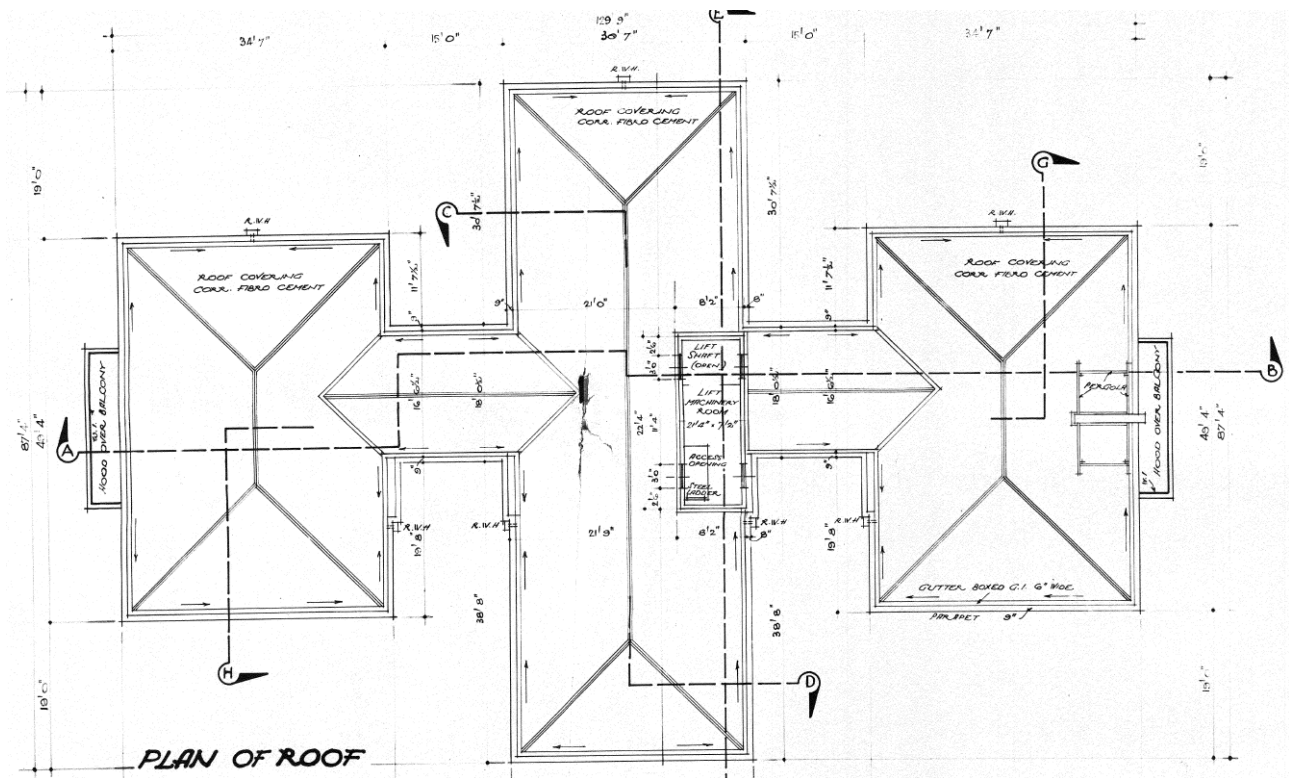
drawing for original seven storey design – roof plan (Source: BP, sheet 4)
